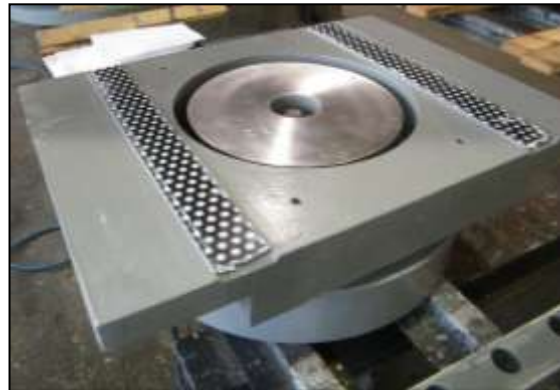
A free sliding uplift bearing during assembly, before placing of the sliding plate on top.
